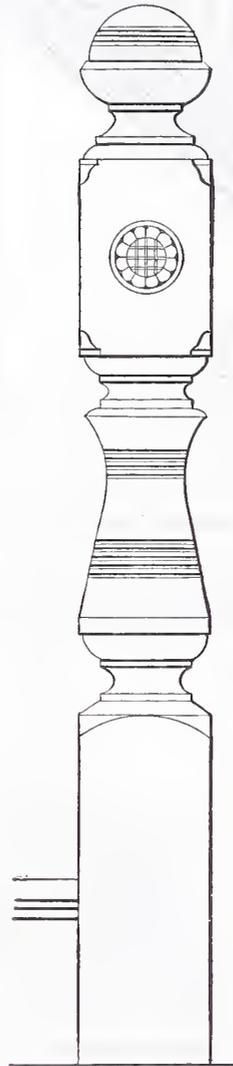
Newel at Foot of Stairs.—Scale, $1\frac{1}{2}$ Inches to the Foot.
